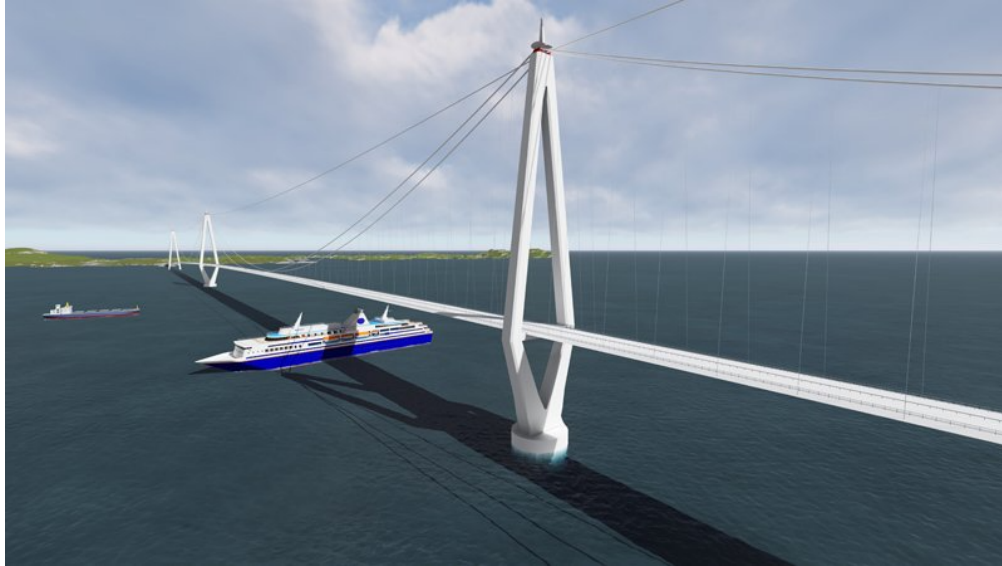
Design concept for crossing Bjørnafjorden, TLP bridge (Statens Vegvesen, 2016b)
